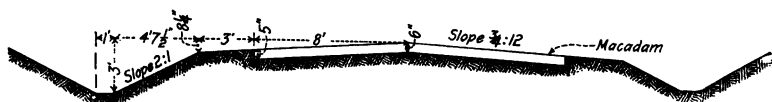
STANDARD CROSS-SECTION FOR MACADAM ROADS, MASSACHUSETTS HIGHWAY COMMISSION.
